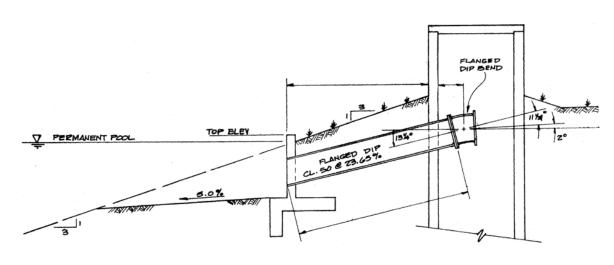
Reverse Slope Pipe Outlet
